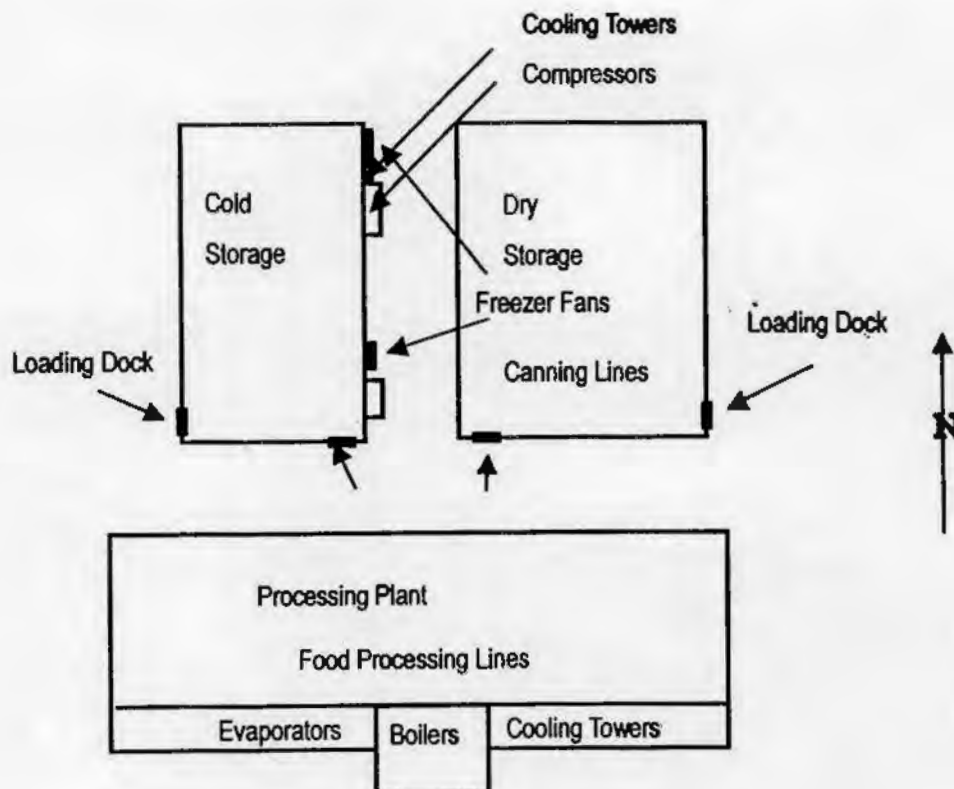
Site Plan of the Proposed Development with Potential Noise Source Identification.
